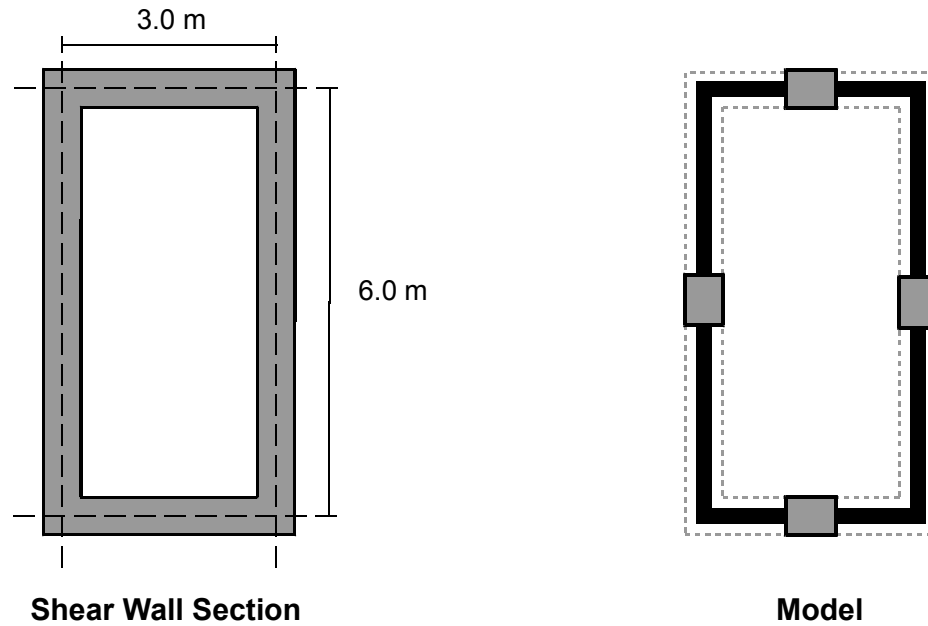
Plan of a Rectangular Shear Wall Assembly and Its Proposed Model
